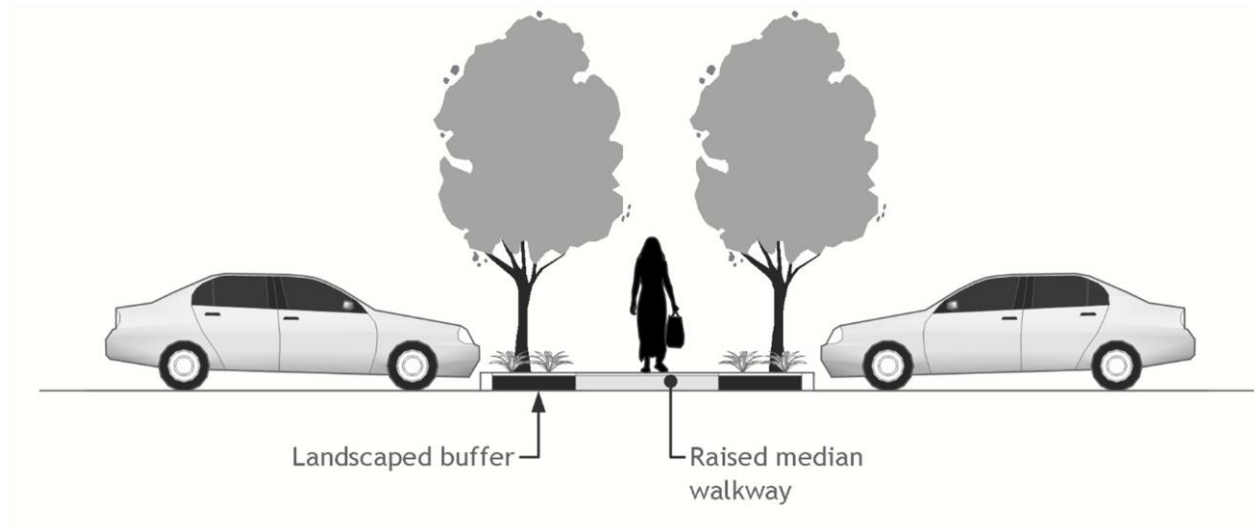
C: Pedestrian Walkways in Parking Lots
